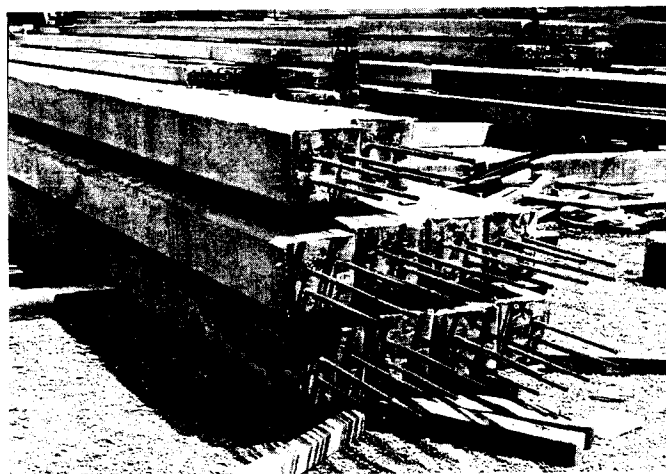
These 14-inch (356 mm) square prestressed concrete piles are stacked in a contractor's yard and are ready to be driven. The bars emerging from the end of these piles are conventional rebars that have been embedded in the end of the pile (they are not the reinforcing tendons). These rebars are used to structurally connect the pile with the pile cap.
